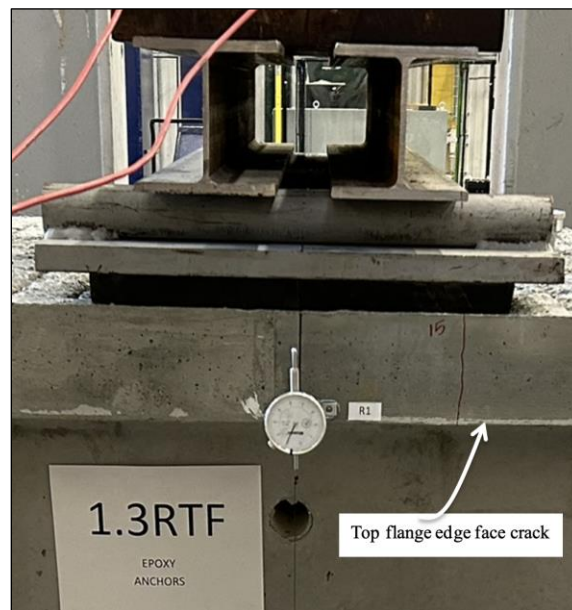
Photo. Test 1.4.F (repair 1.3RTF, 1.3LTF) top flange edge face crack at 15 kip (right face of girder pictured).
